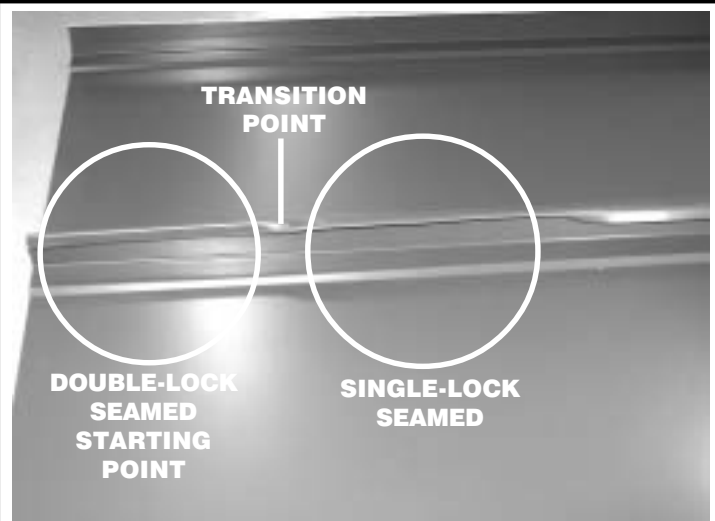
CLOSE-UP OF HAND-CRIMPED SEAM READY FOR MACHINE SEAMING.
